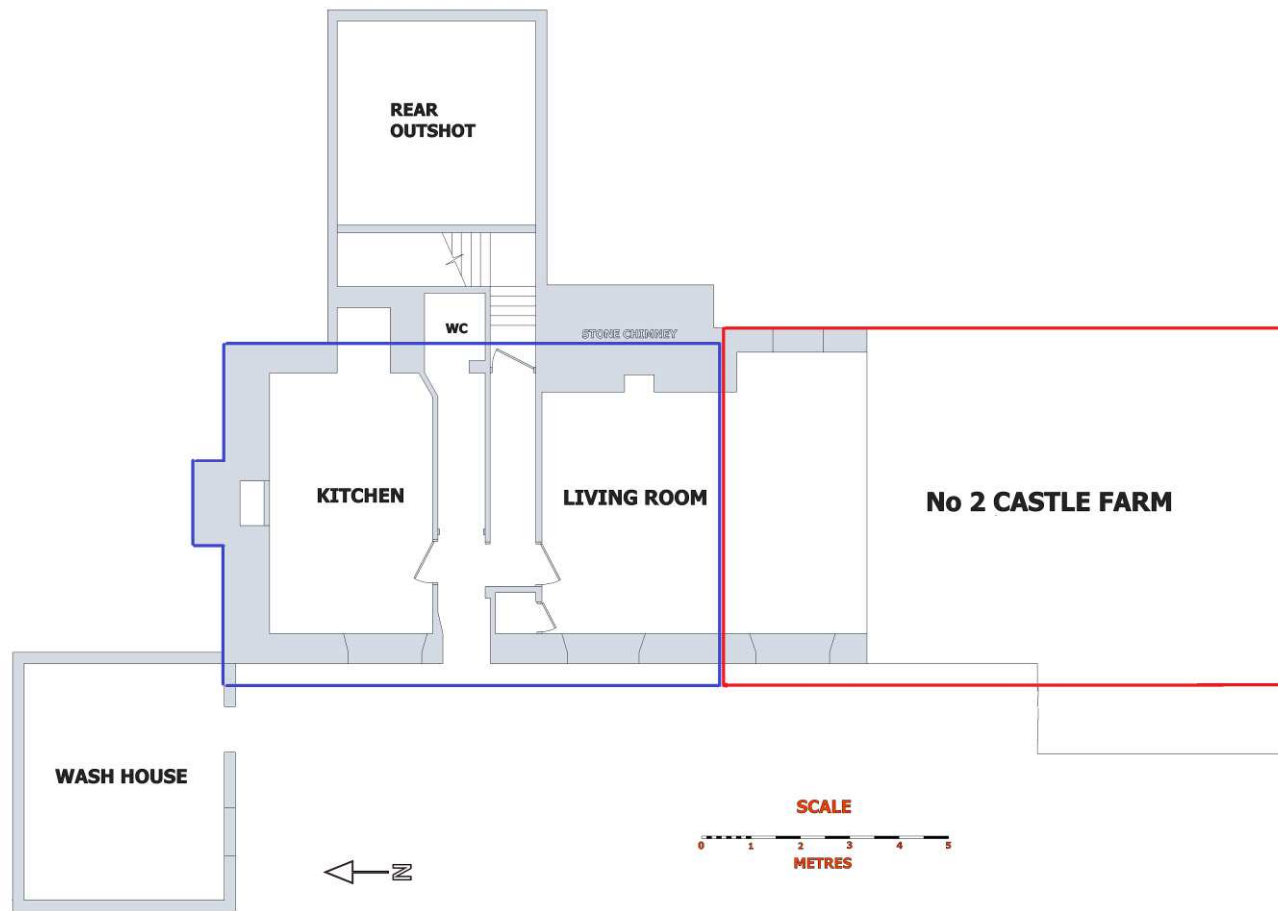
Farmhouse, ground-floor plan, showing the primary building (outlined in blue) and southern extension (outlined in red) (after Charles Glenn)
